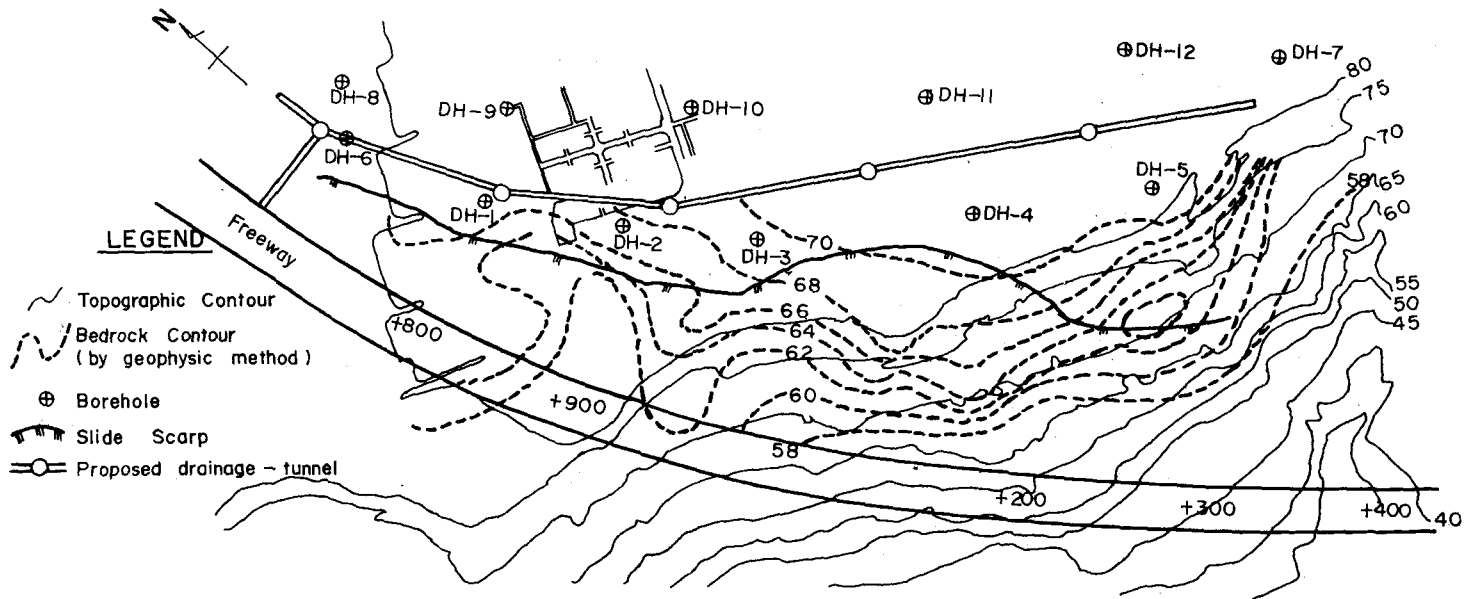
SITE PLAN OF DRAINAGE TUNNEL AT 62 K OF S-N FREEWAY
